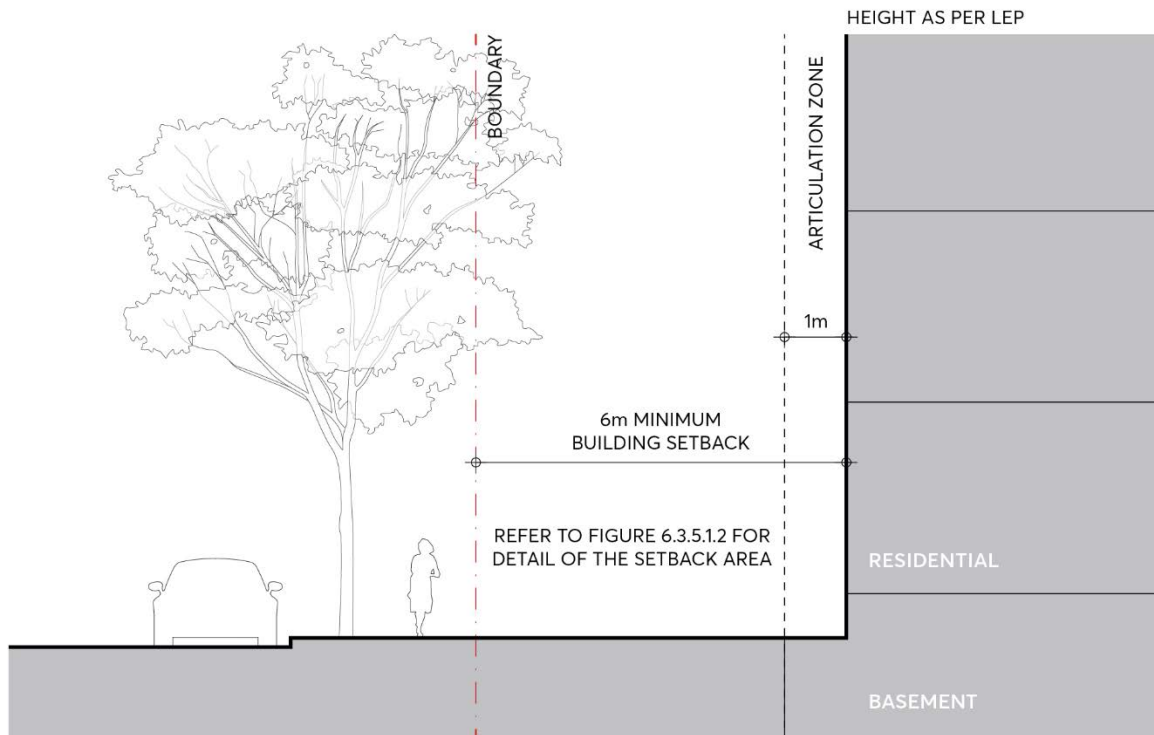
Street Setbacks - Residential Ground Floor street frontage
